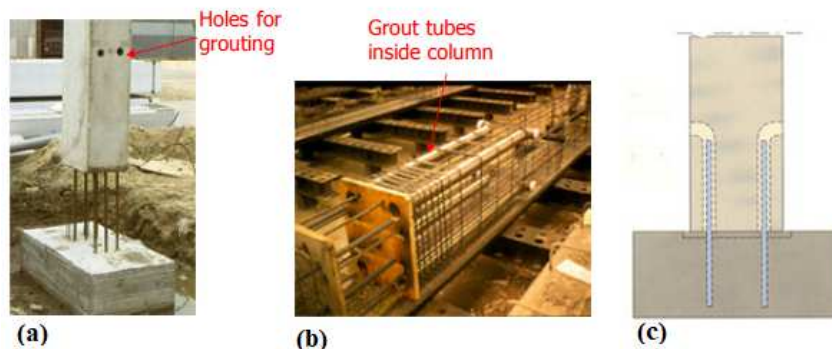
Sleeve connection: (a) installation process (b) production (c) scheme (4)
